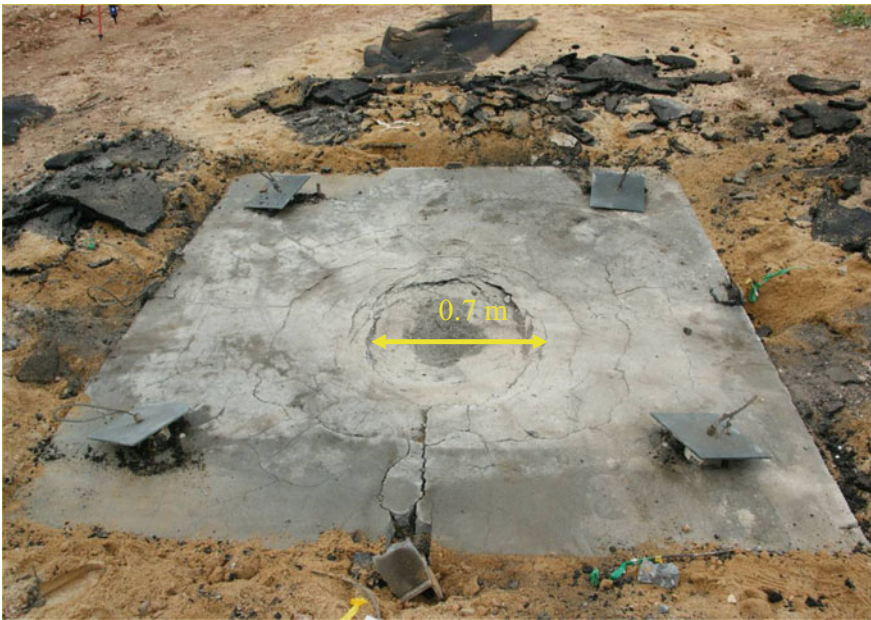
Damage of proposed multi-layer pavement after blast (Removing AC layer)
